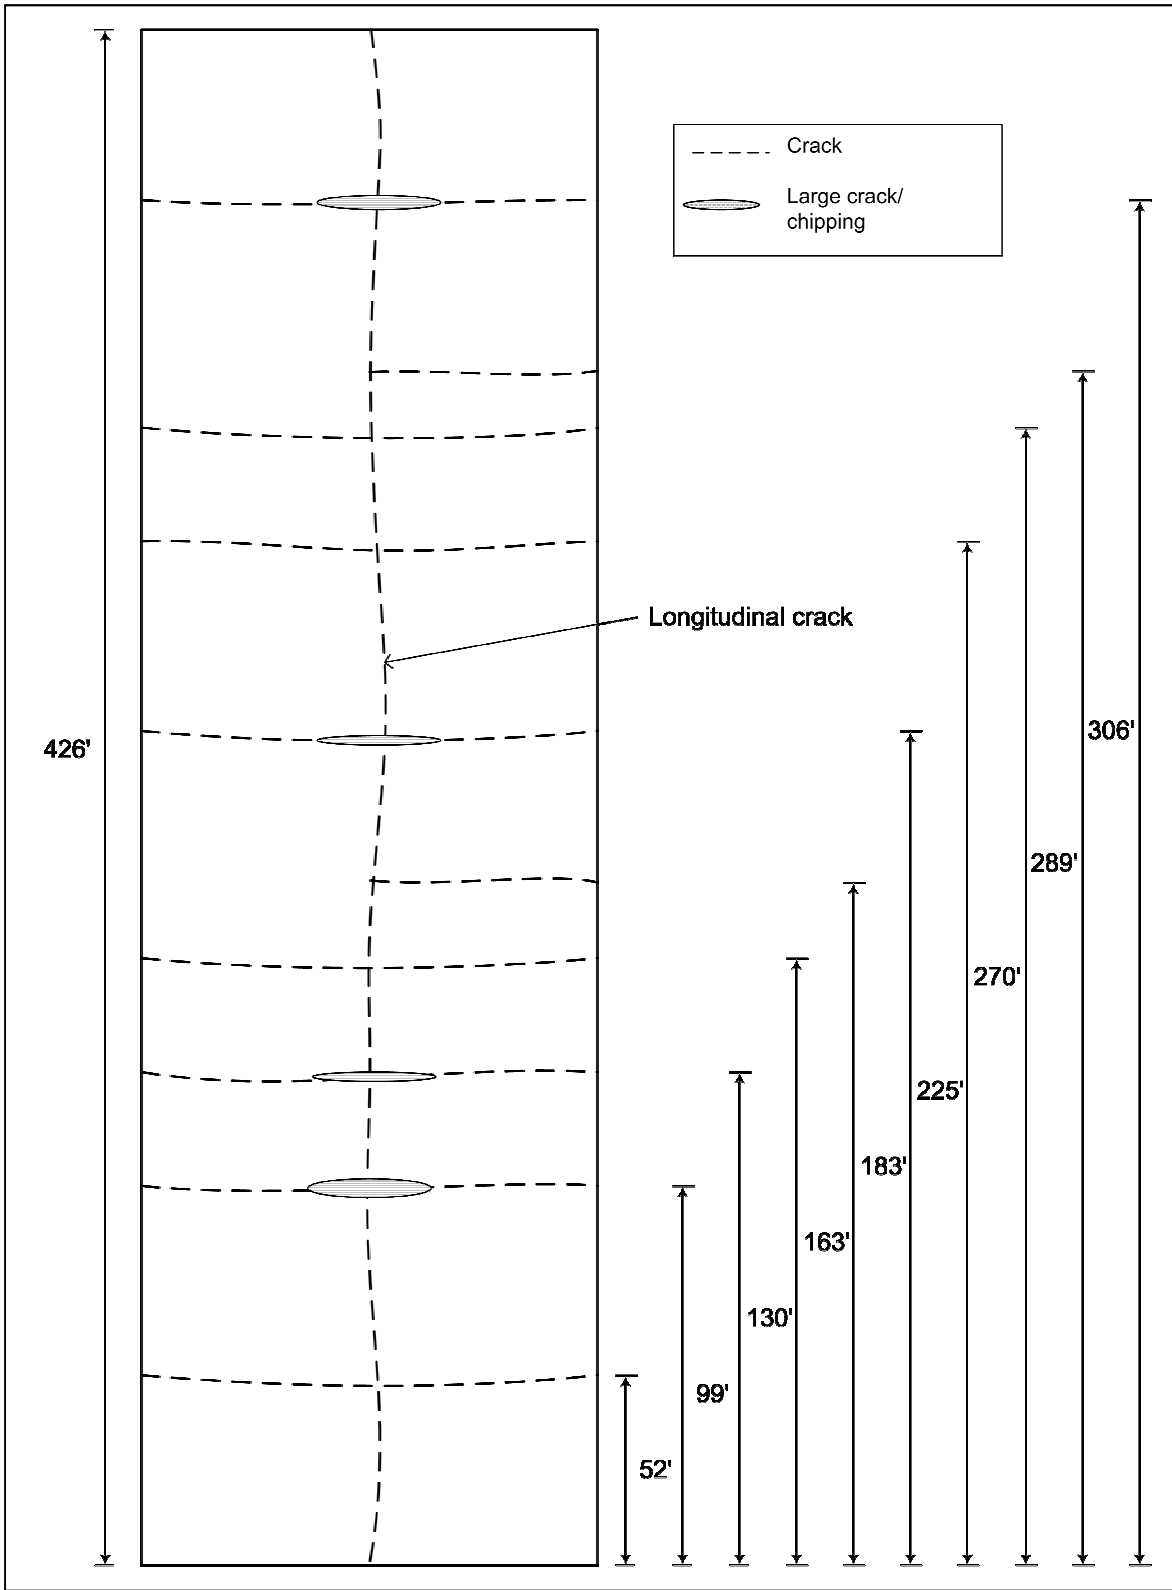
Sketch of crack pattern on the pavement at WCR 28
